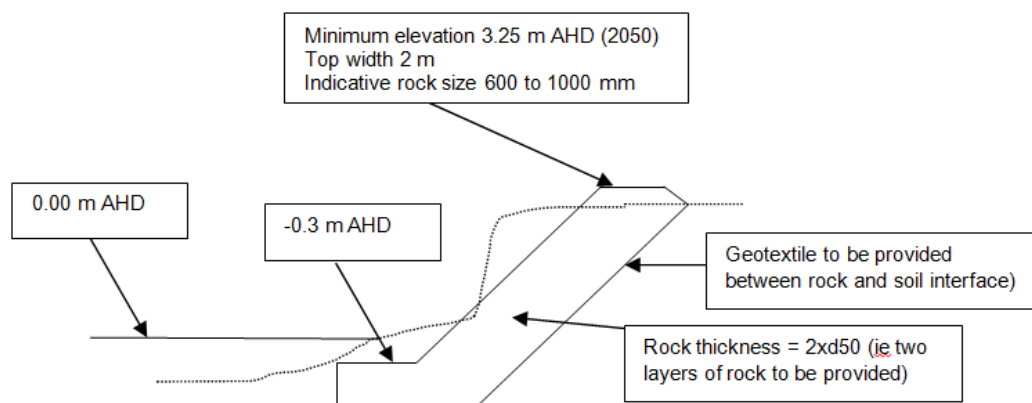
Rock armour wall concept sketch (G. Fisher, AWE, 2014)
